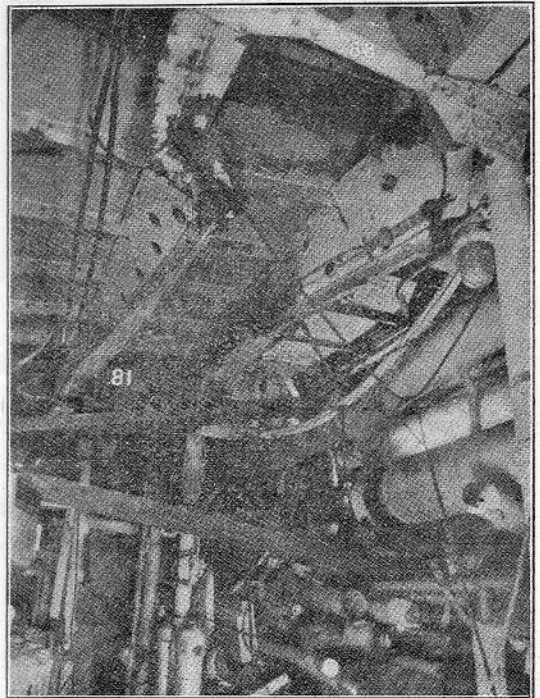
Sagging Test. View of Port Intermediate and Outboard Deck Girders, showing General Twist in Girders, Frames 81-88, looking forward.
